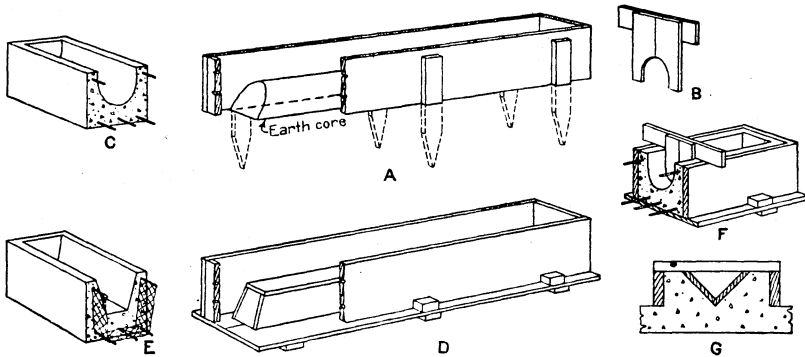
Construction of feeding troughs, reinforced with $\frac{1}{4}$ -inch rods or lightweight woven wire: *A*, Form for casting trough upside down; *B*, template; *C*, section of completed trough; *D*, wooden core and pallet; *E*, section of completed trough; *F*, form for casting trough upright; *G*, form for casting trough directly on concrete floor.
